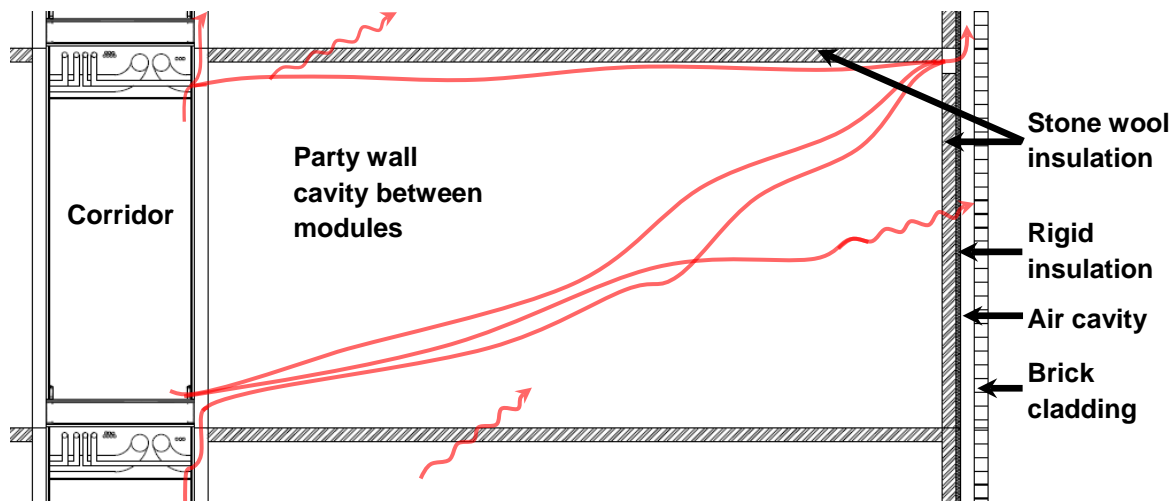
Section drawing of the party wall junction showing thermal bypasses
